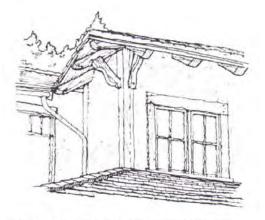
Eave members should visually sturdy, and detailed to relate to the rest of the building's architectural language.
